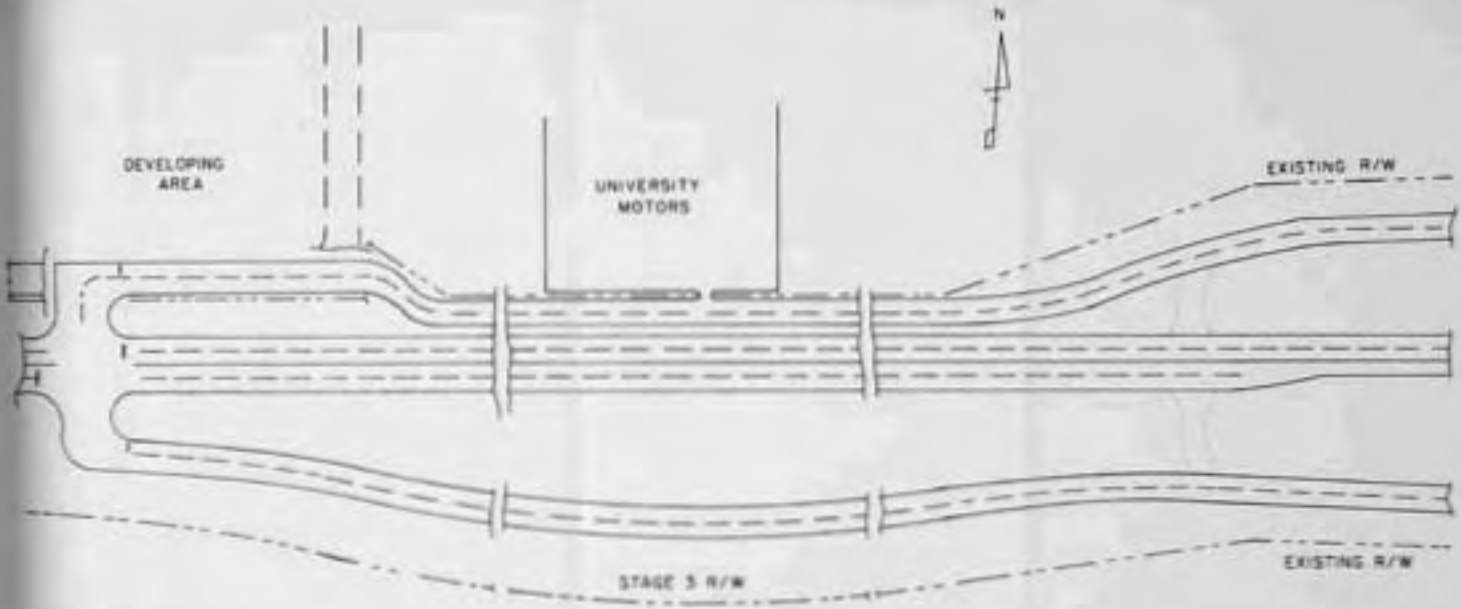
HAPPY HOLLOW - SOLDIERS HOME ROAD INTERSECTION WITH U.S. 52 BYPASS; STAGE 2 RECOMMENDED MODIFICATIONS
